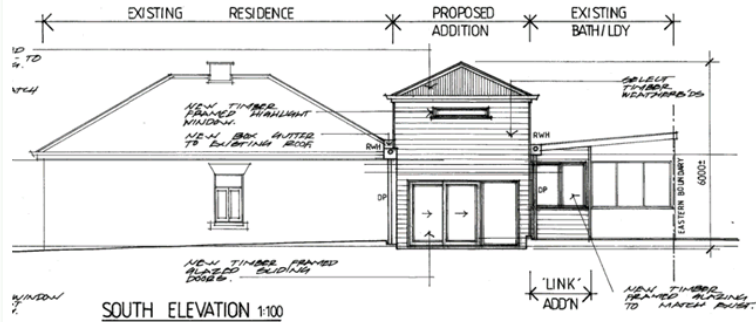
Southern (side) elevation of the previously refused application PLN-16-00492.
